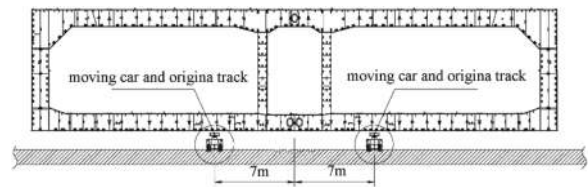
Layout diagram of pipe section for rail type hydraulic carriage (cross section).
